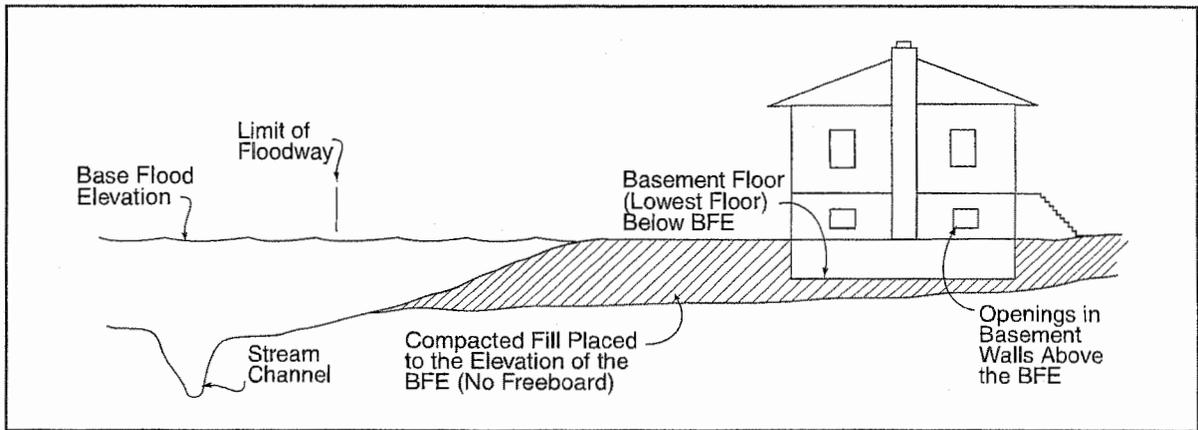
Basement foundation with lowest opening above the BFE. Surface flooding is less likely to enter and inundate the basement.
